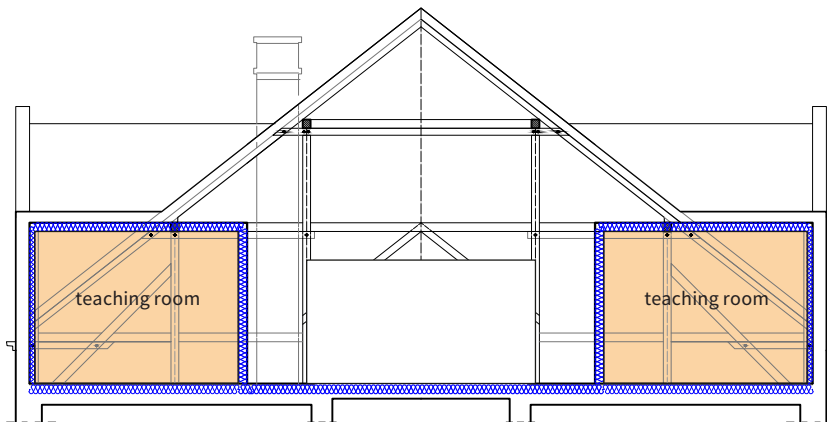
Cross-section of the attic: thermal insulation of spaces adapted as teaching rooms. Drawing: Agata Zapart.
